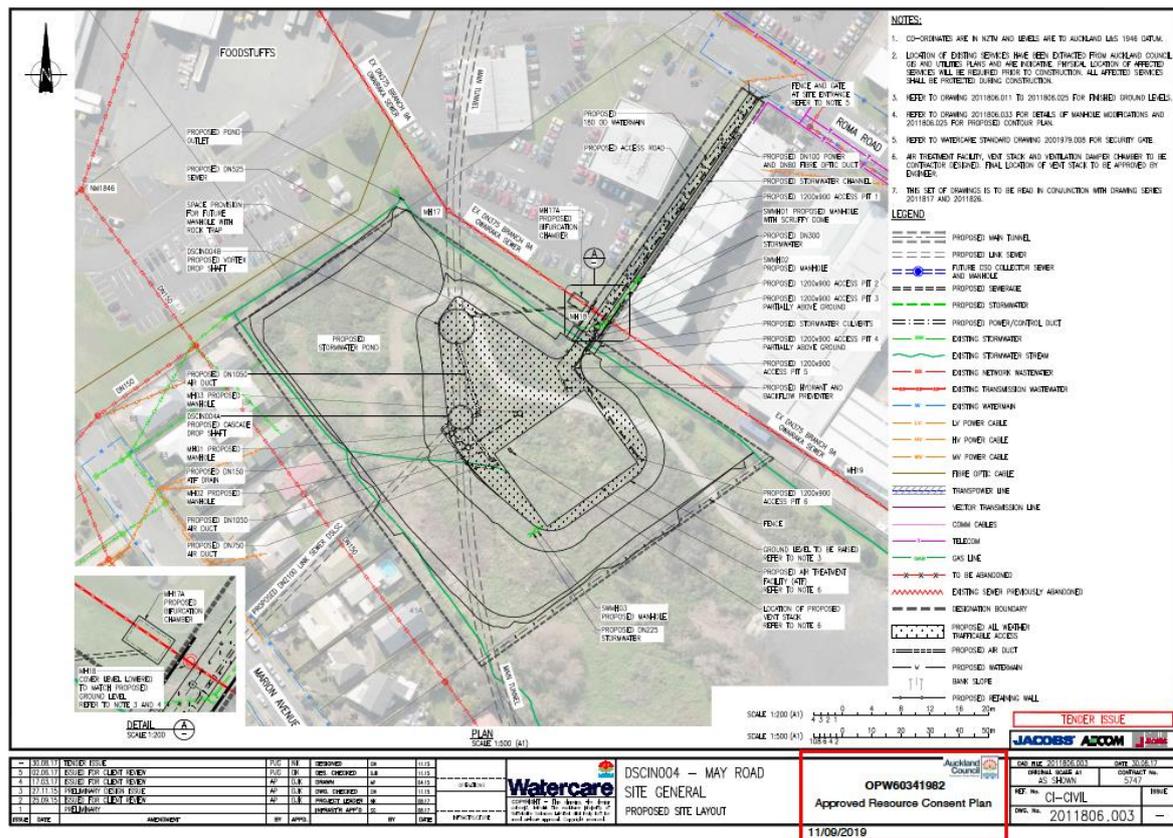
"Stage 3" proposed site layout 54 Roma Road
